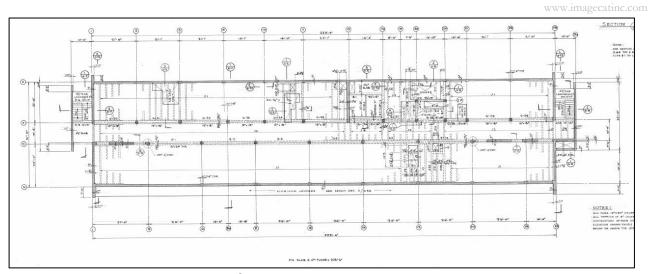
4<sup>th</sup> Floor Framing Plan (North Tower)
